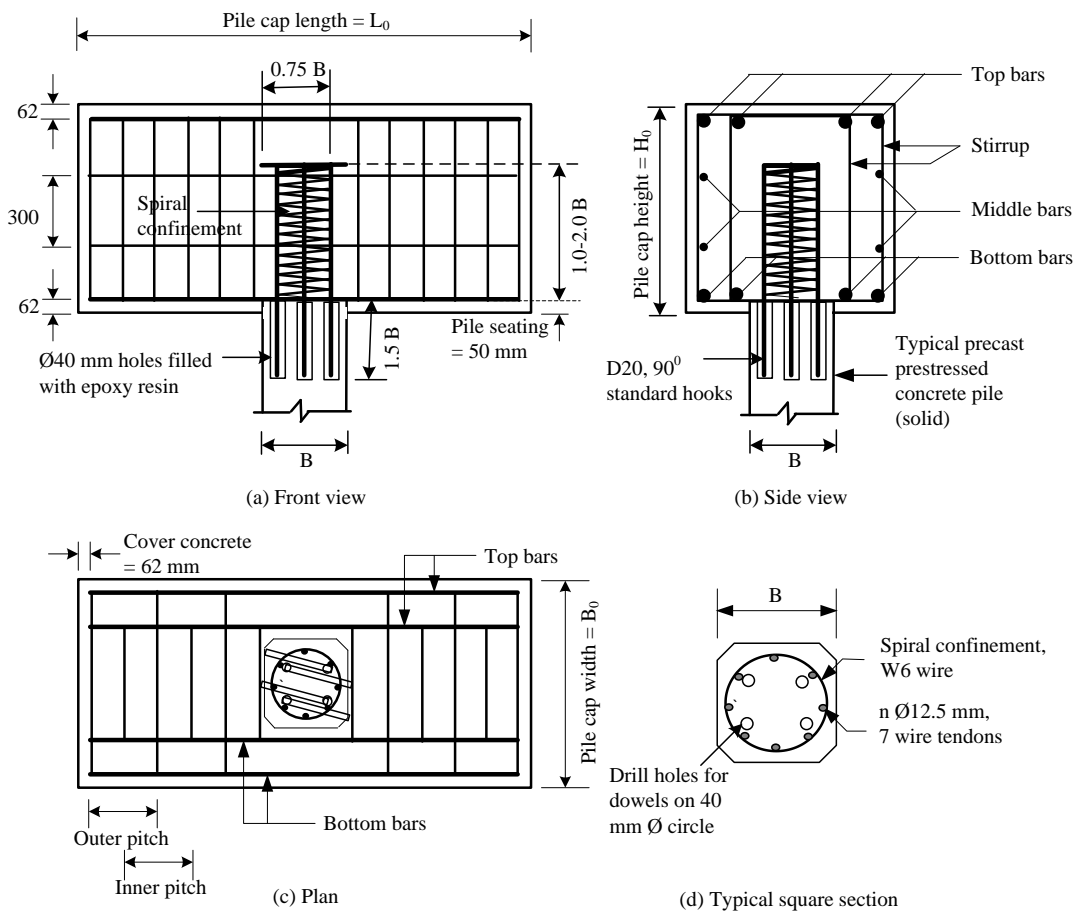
Detail of recommended pile-to-pile cap connection Type-II
